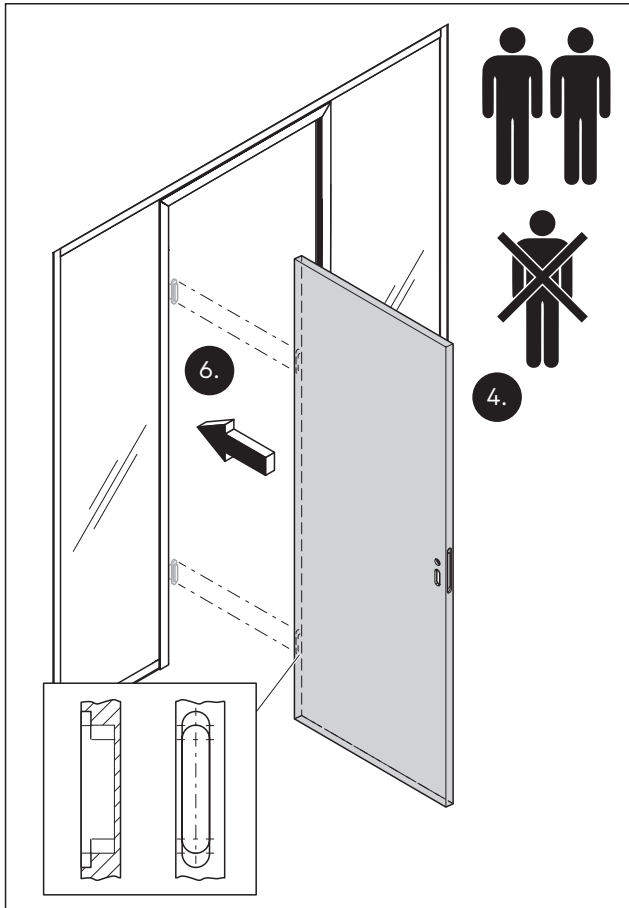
Mount the wooden door with the TECTUS door hinges on the door frame
